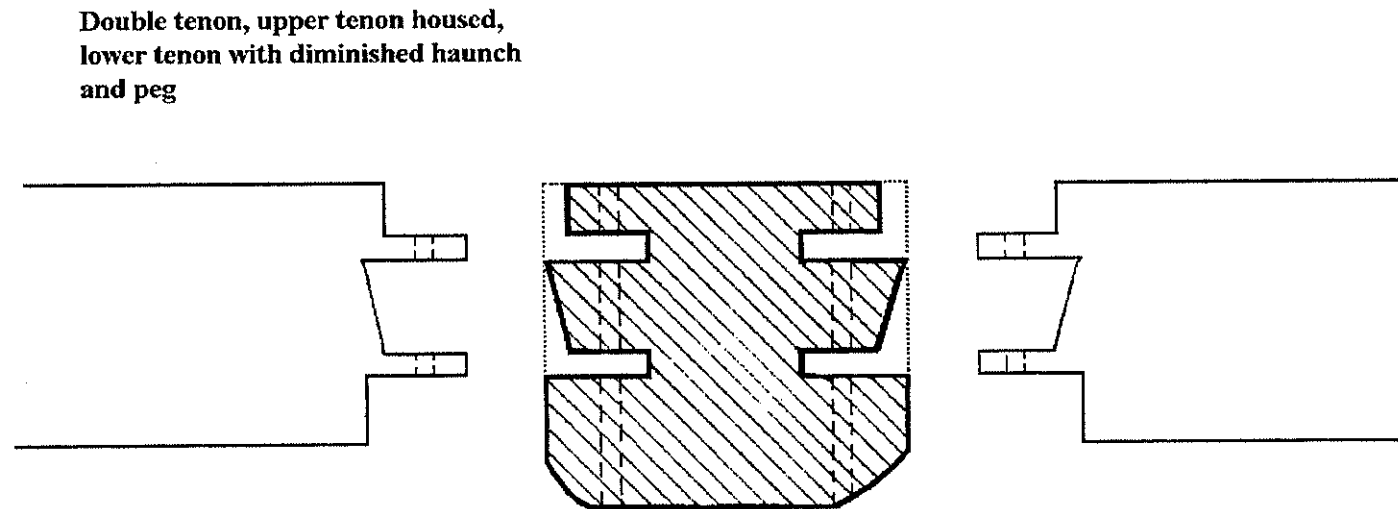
Drawing to show the main floor beam and common joist assembly from the ground floor construction of Bruce Castle, Tottenham, London
